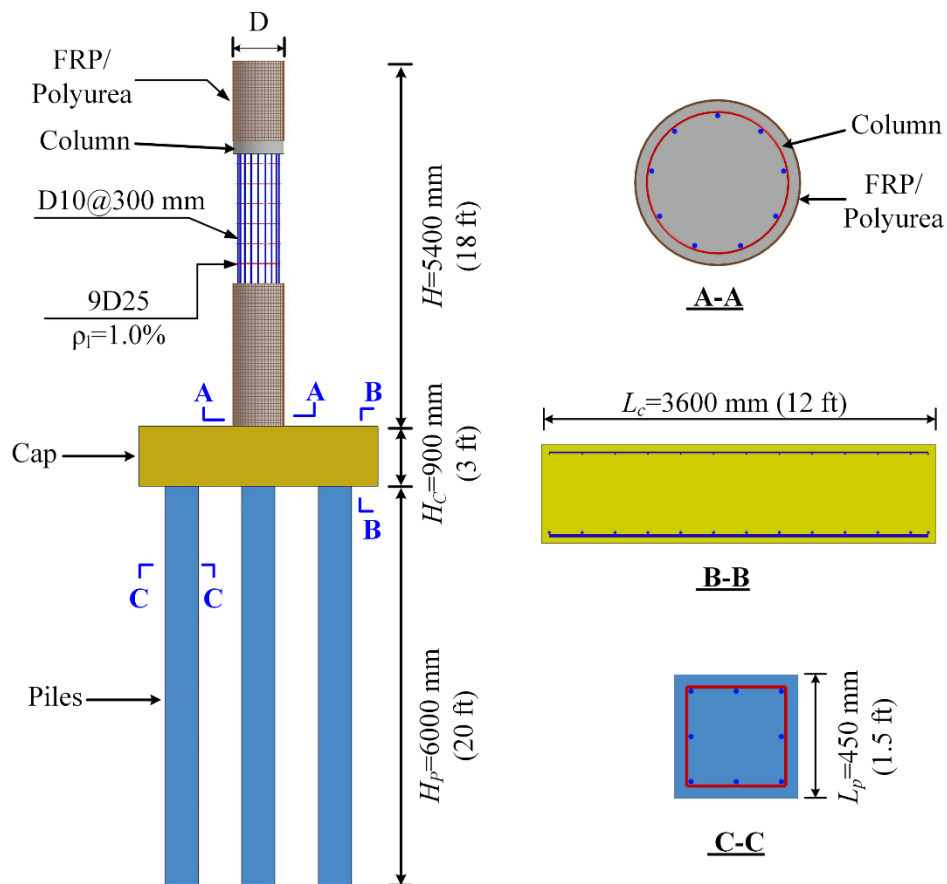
Geometries and reinforcement details in bridge column with a coating
